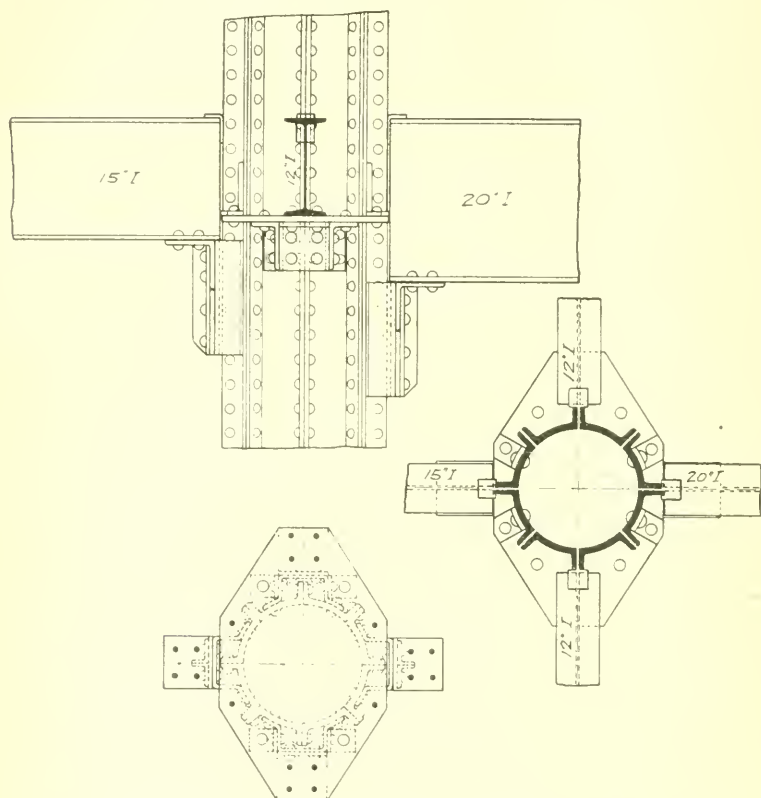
CONNECTION BETWEEN ROLLED BEAMS AND PHOENIX COLUMNS, AS DESIGNED FOR THE OLD COLONY BUILDING, CHICAGO.
